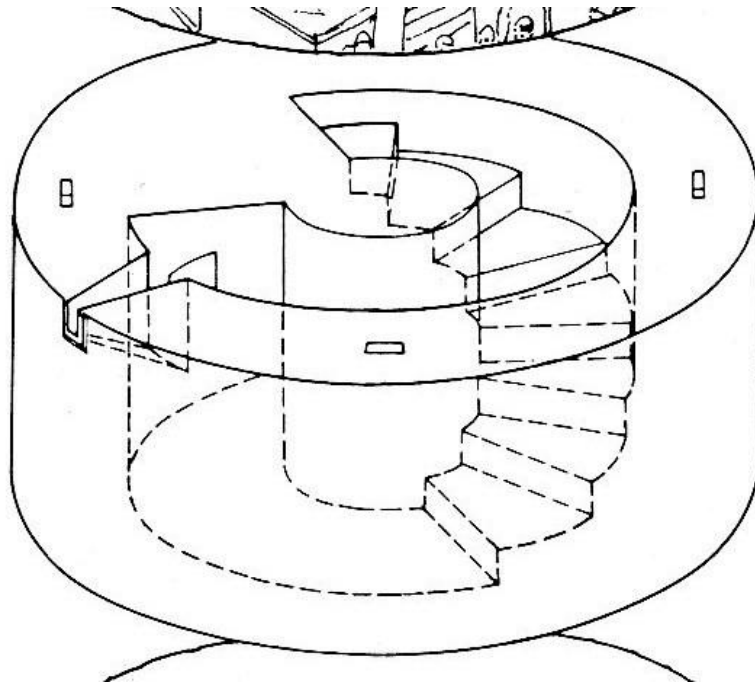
Trajan's Column: Jones's Drawing.⁶⁷⁵
